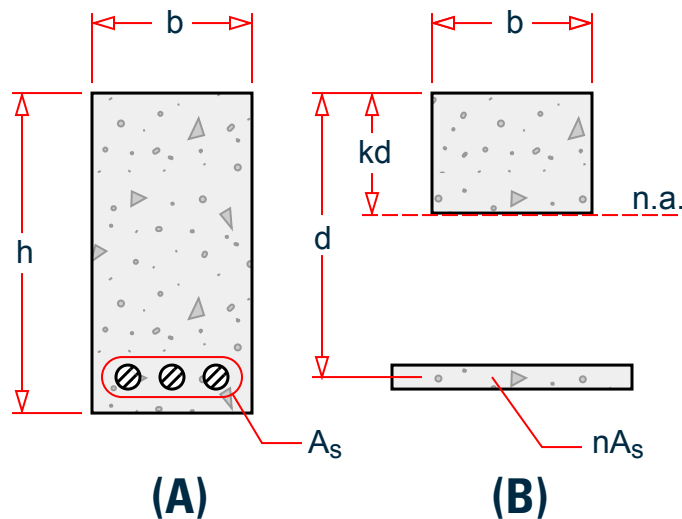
Gross section (A) and cracked transform section (B) for rectangular shapes
